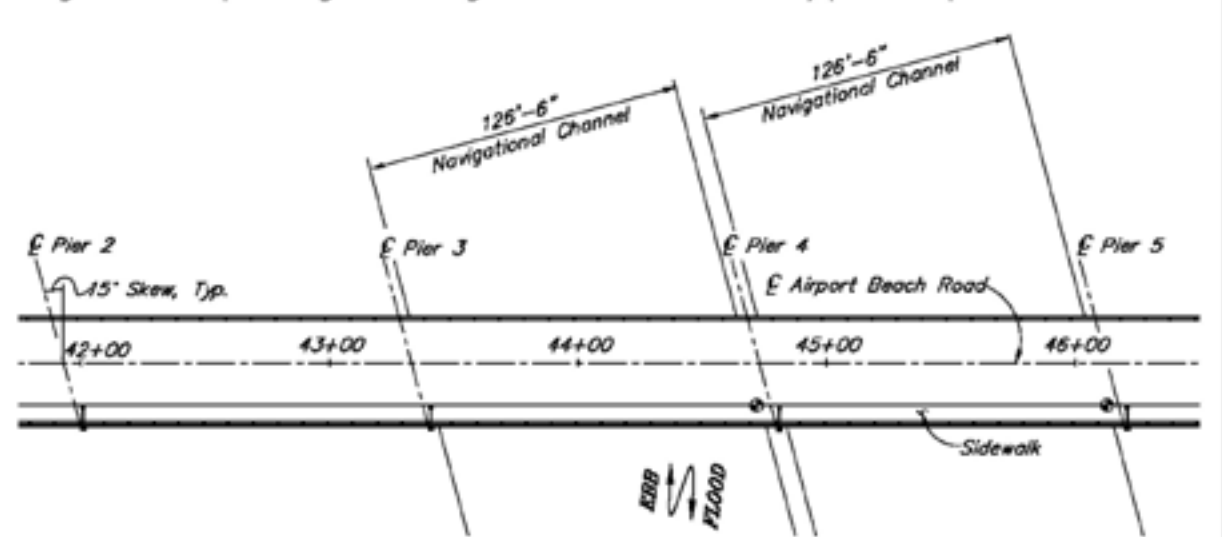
Bridge plan view indicating multiple navigation channel width dimensions to substructure units in the waterway. (Source: Alaska DOT)
